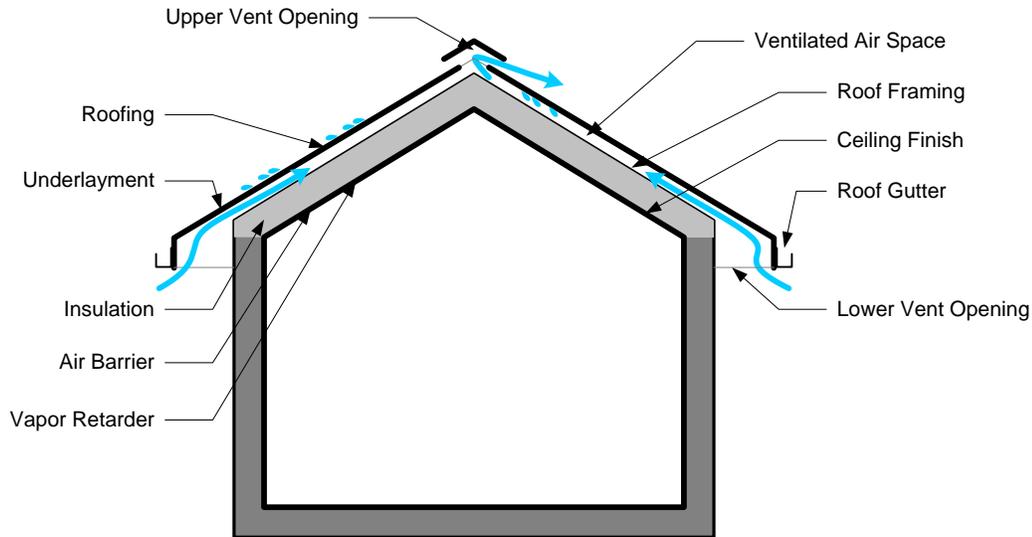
Ventilating Cathedral Ceiling Roof Assembly (Schumacher 2008)
